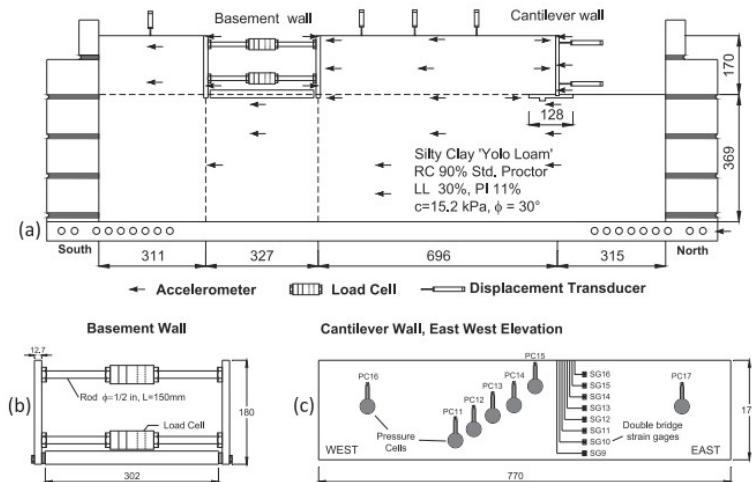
(a) Experimental setup: FSB container, soil, and structures, (b) basement wall elevation, (c) pressure cells and strain gages on cantilever wall. All dimensions in mm.
